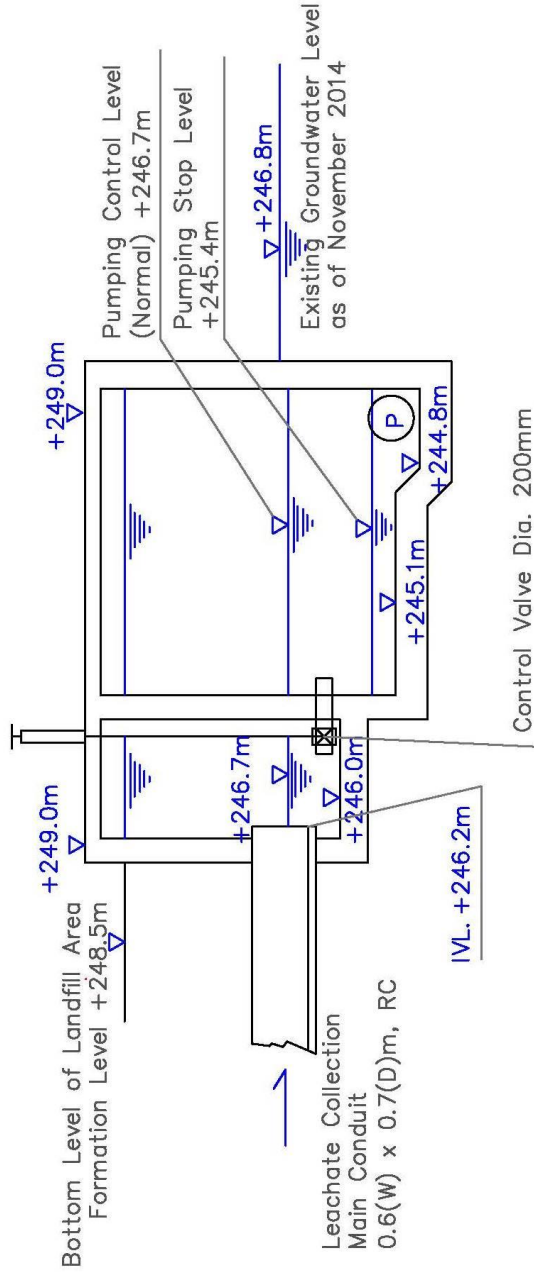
Profile of Improvement Work of Gondlanwala Disposal Site
